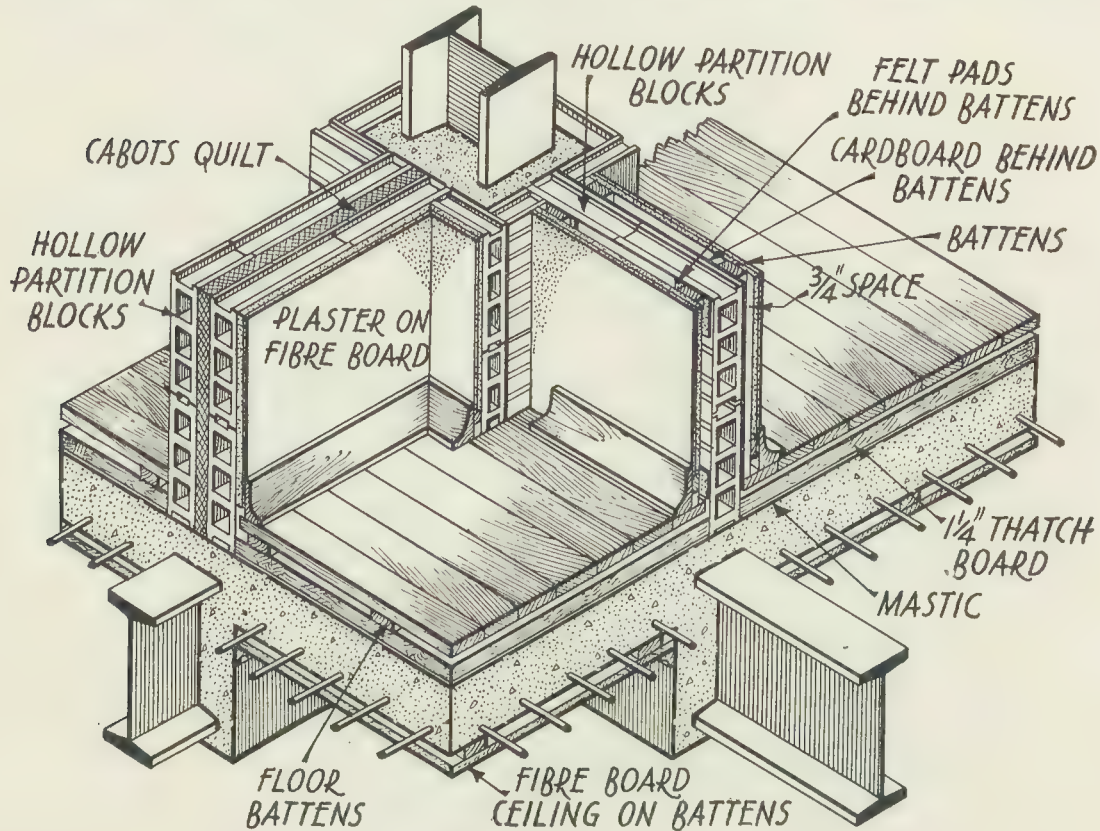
SOUND-PROOFING HOLLOW BLOCK PARTITION WALL AND REINFORCED CONCRETE UPPER FLOORS
